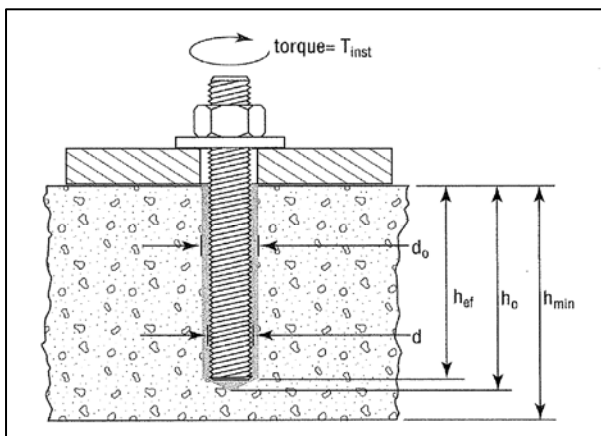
ANCHOR INSTALLATION INSTRUCTIONS
